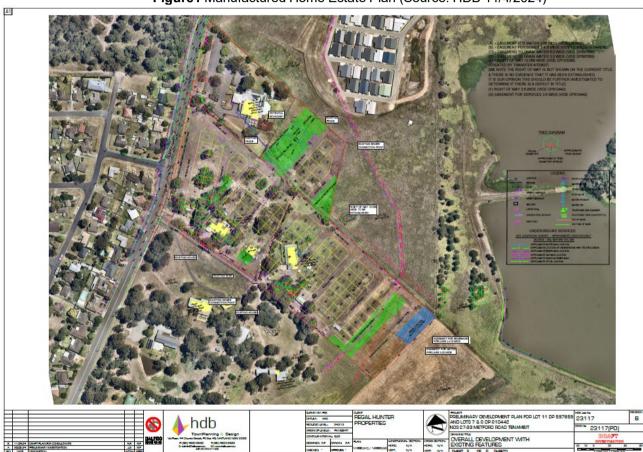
Manufactured Home Estate Plan (Source: HDB 11/4/2024)
